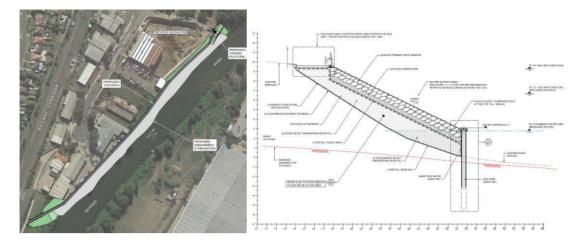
Concept design extent of revetment stabilisation works on the western river bank at Shepherd Street Precinct
